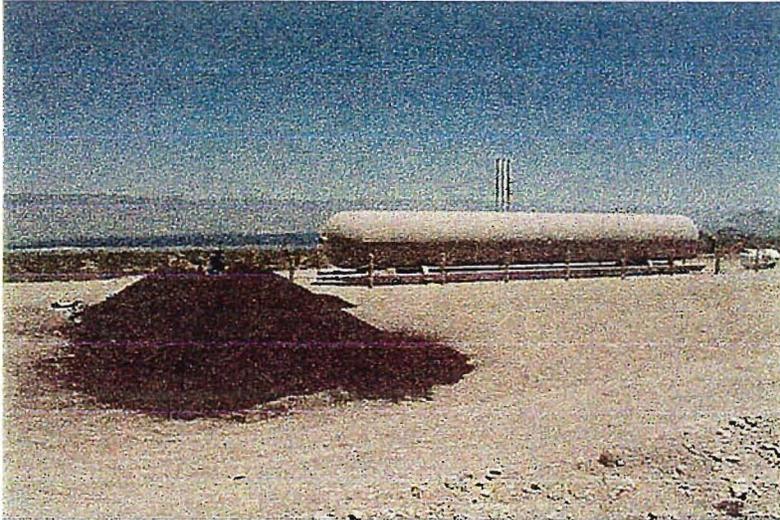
Looking east on the Phoenix R. & D. #VIII. Shows cinder stockpile and propane tank
